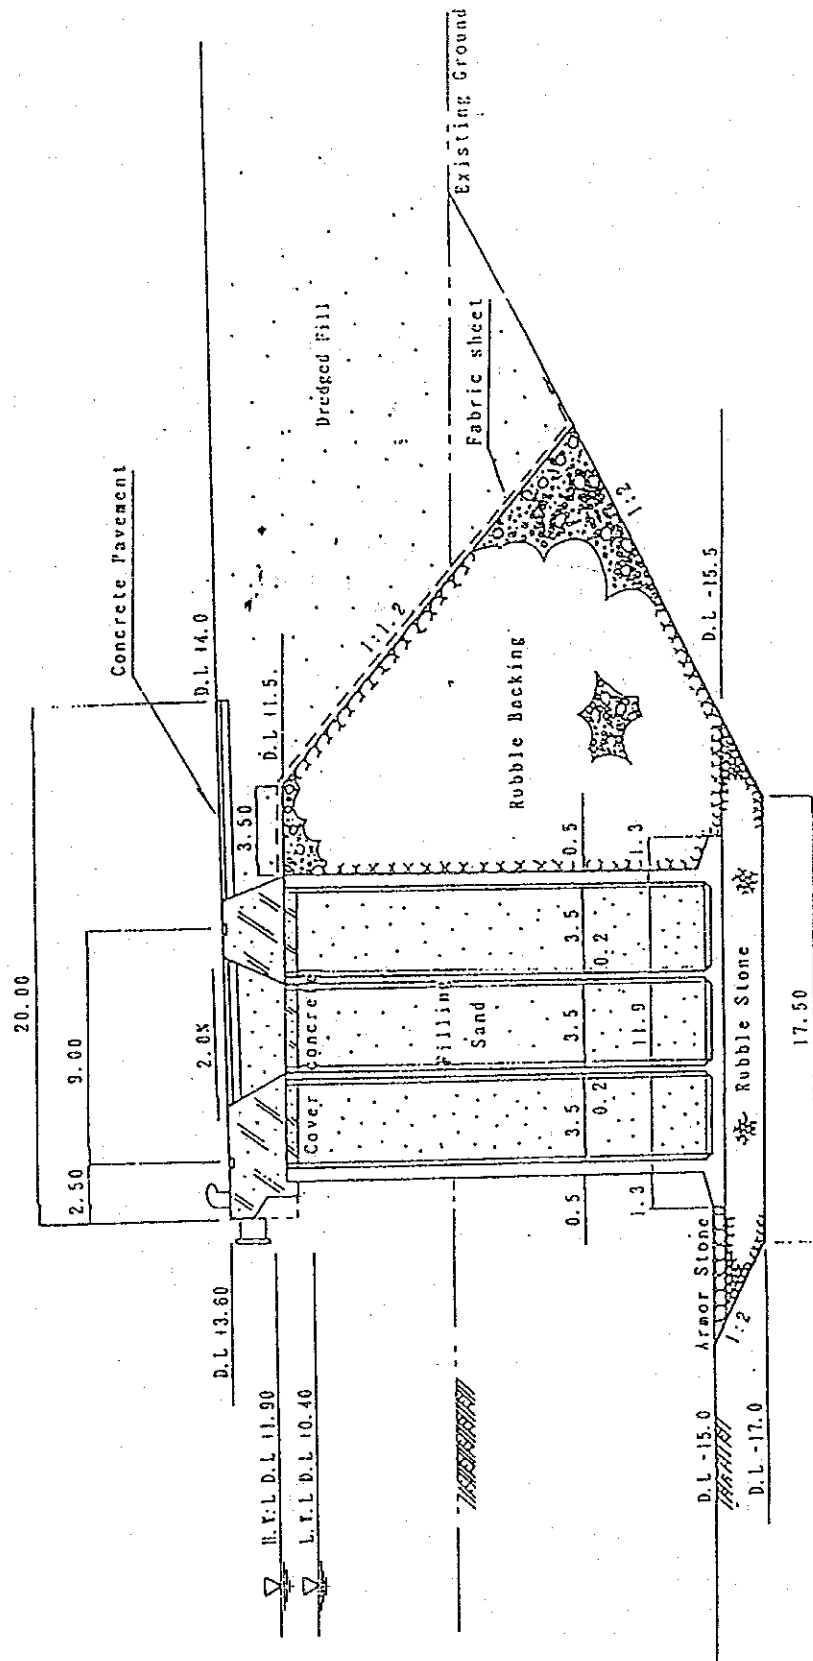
Gravity Type of Concrete Caisson for Grain Quaywall
